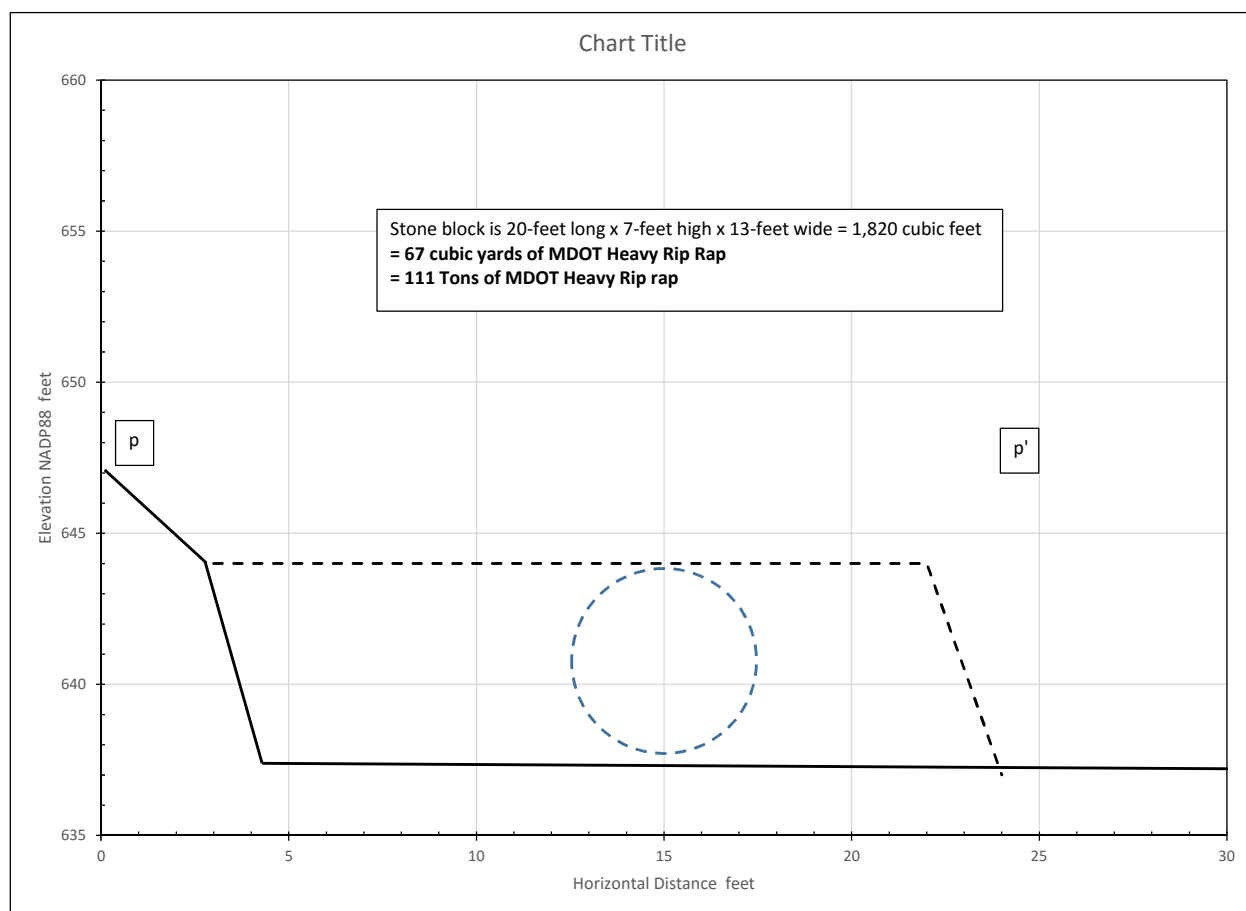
Cross section p-p' showing the stone block at exit of the culvert under Bridge Street.
